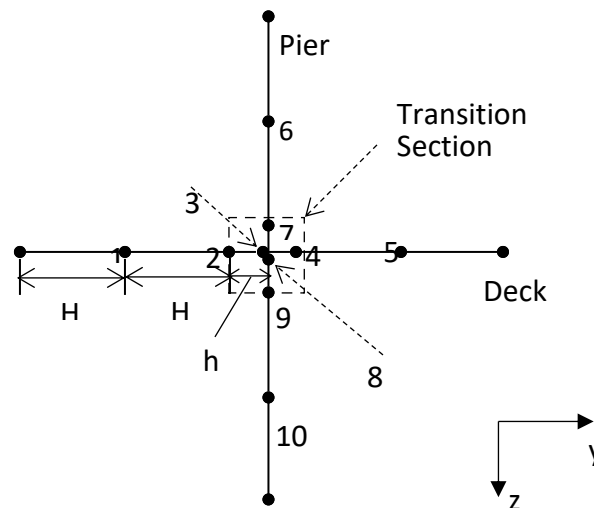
Transition Section between Deck and Pier (Shen et al. 2013)
